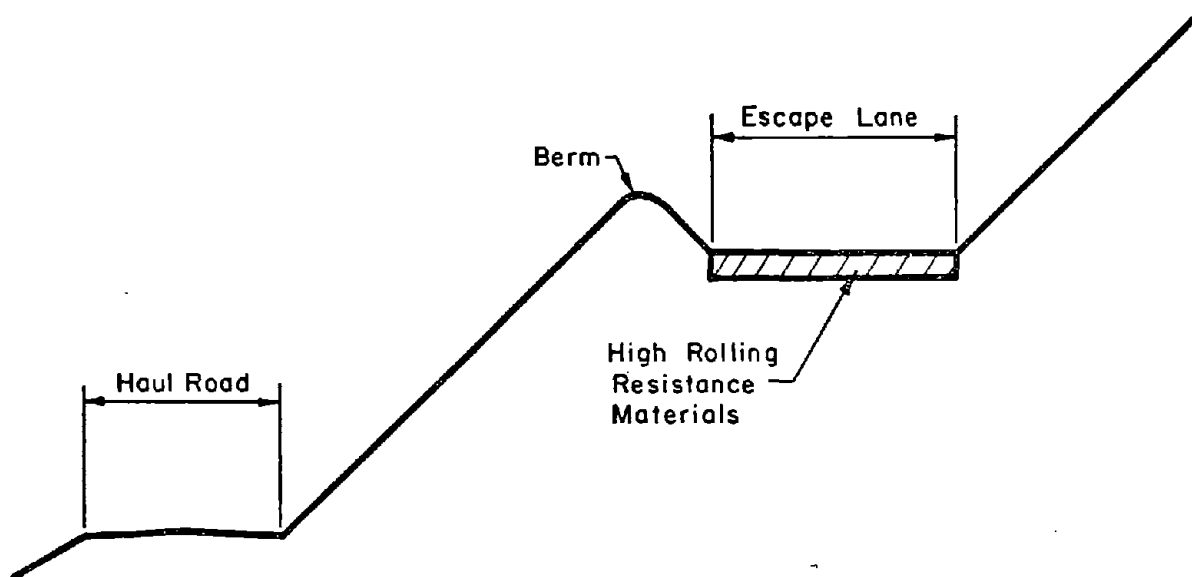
, V-4, V-5 depict typical Plan, Profile, and Section views of an emergency escape lane.
